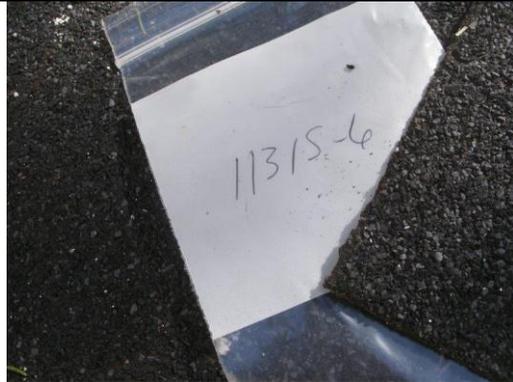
Shingles (1131S-6) Roof. No Asbestos Detected.
